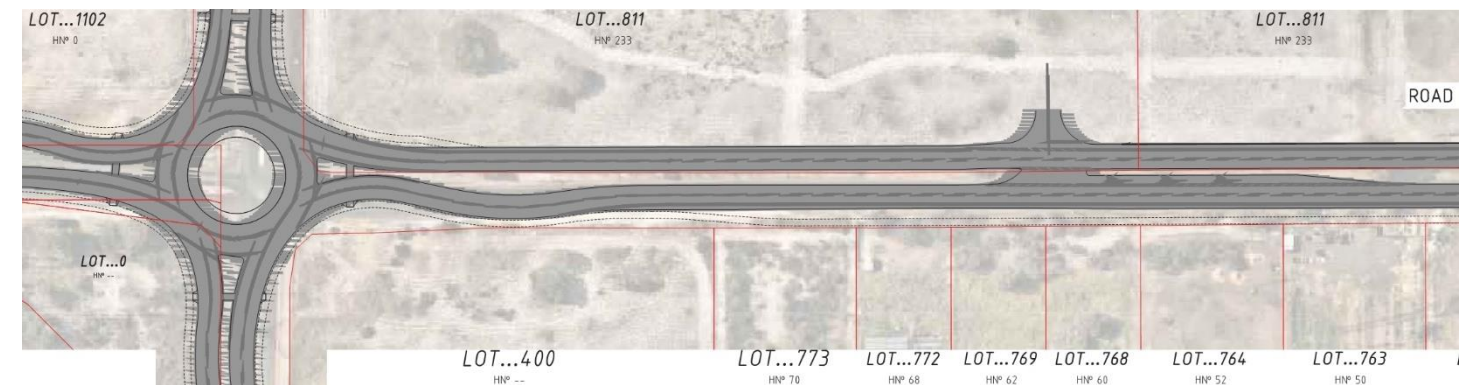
Marshall Road duplication 15% concept design – Beechboro Road North to Silver Swan Road – western section (source: City of Swan Ordinary Council Meeting, 28 July 2021 – Officers Report Item 5.1)
